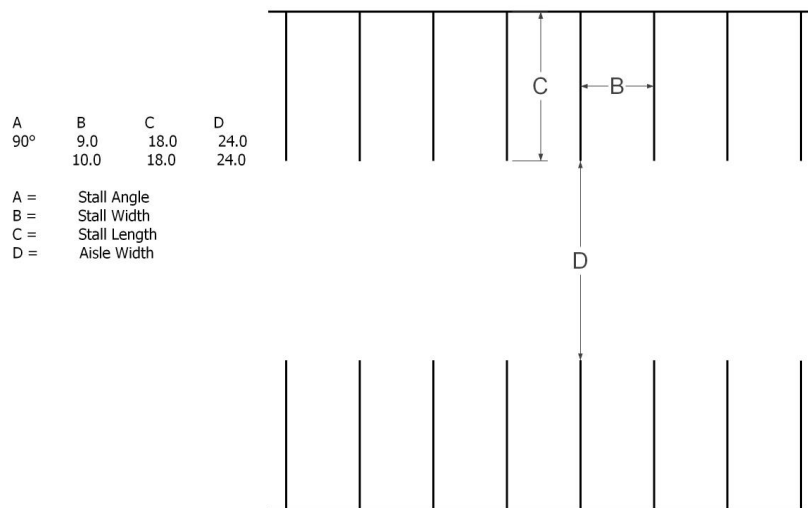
Parking layout dimensions at 90 degree angles (minimum standards)
